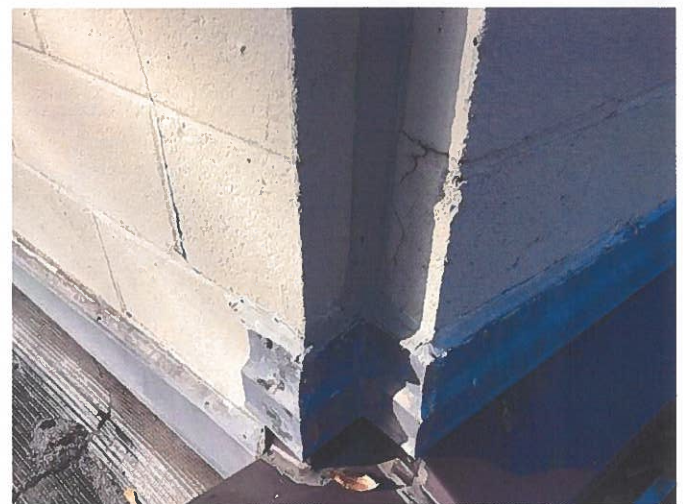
Base flashing detail along Auditorium wall with cover plate added to recess
